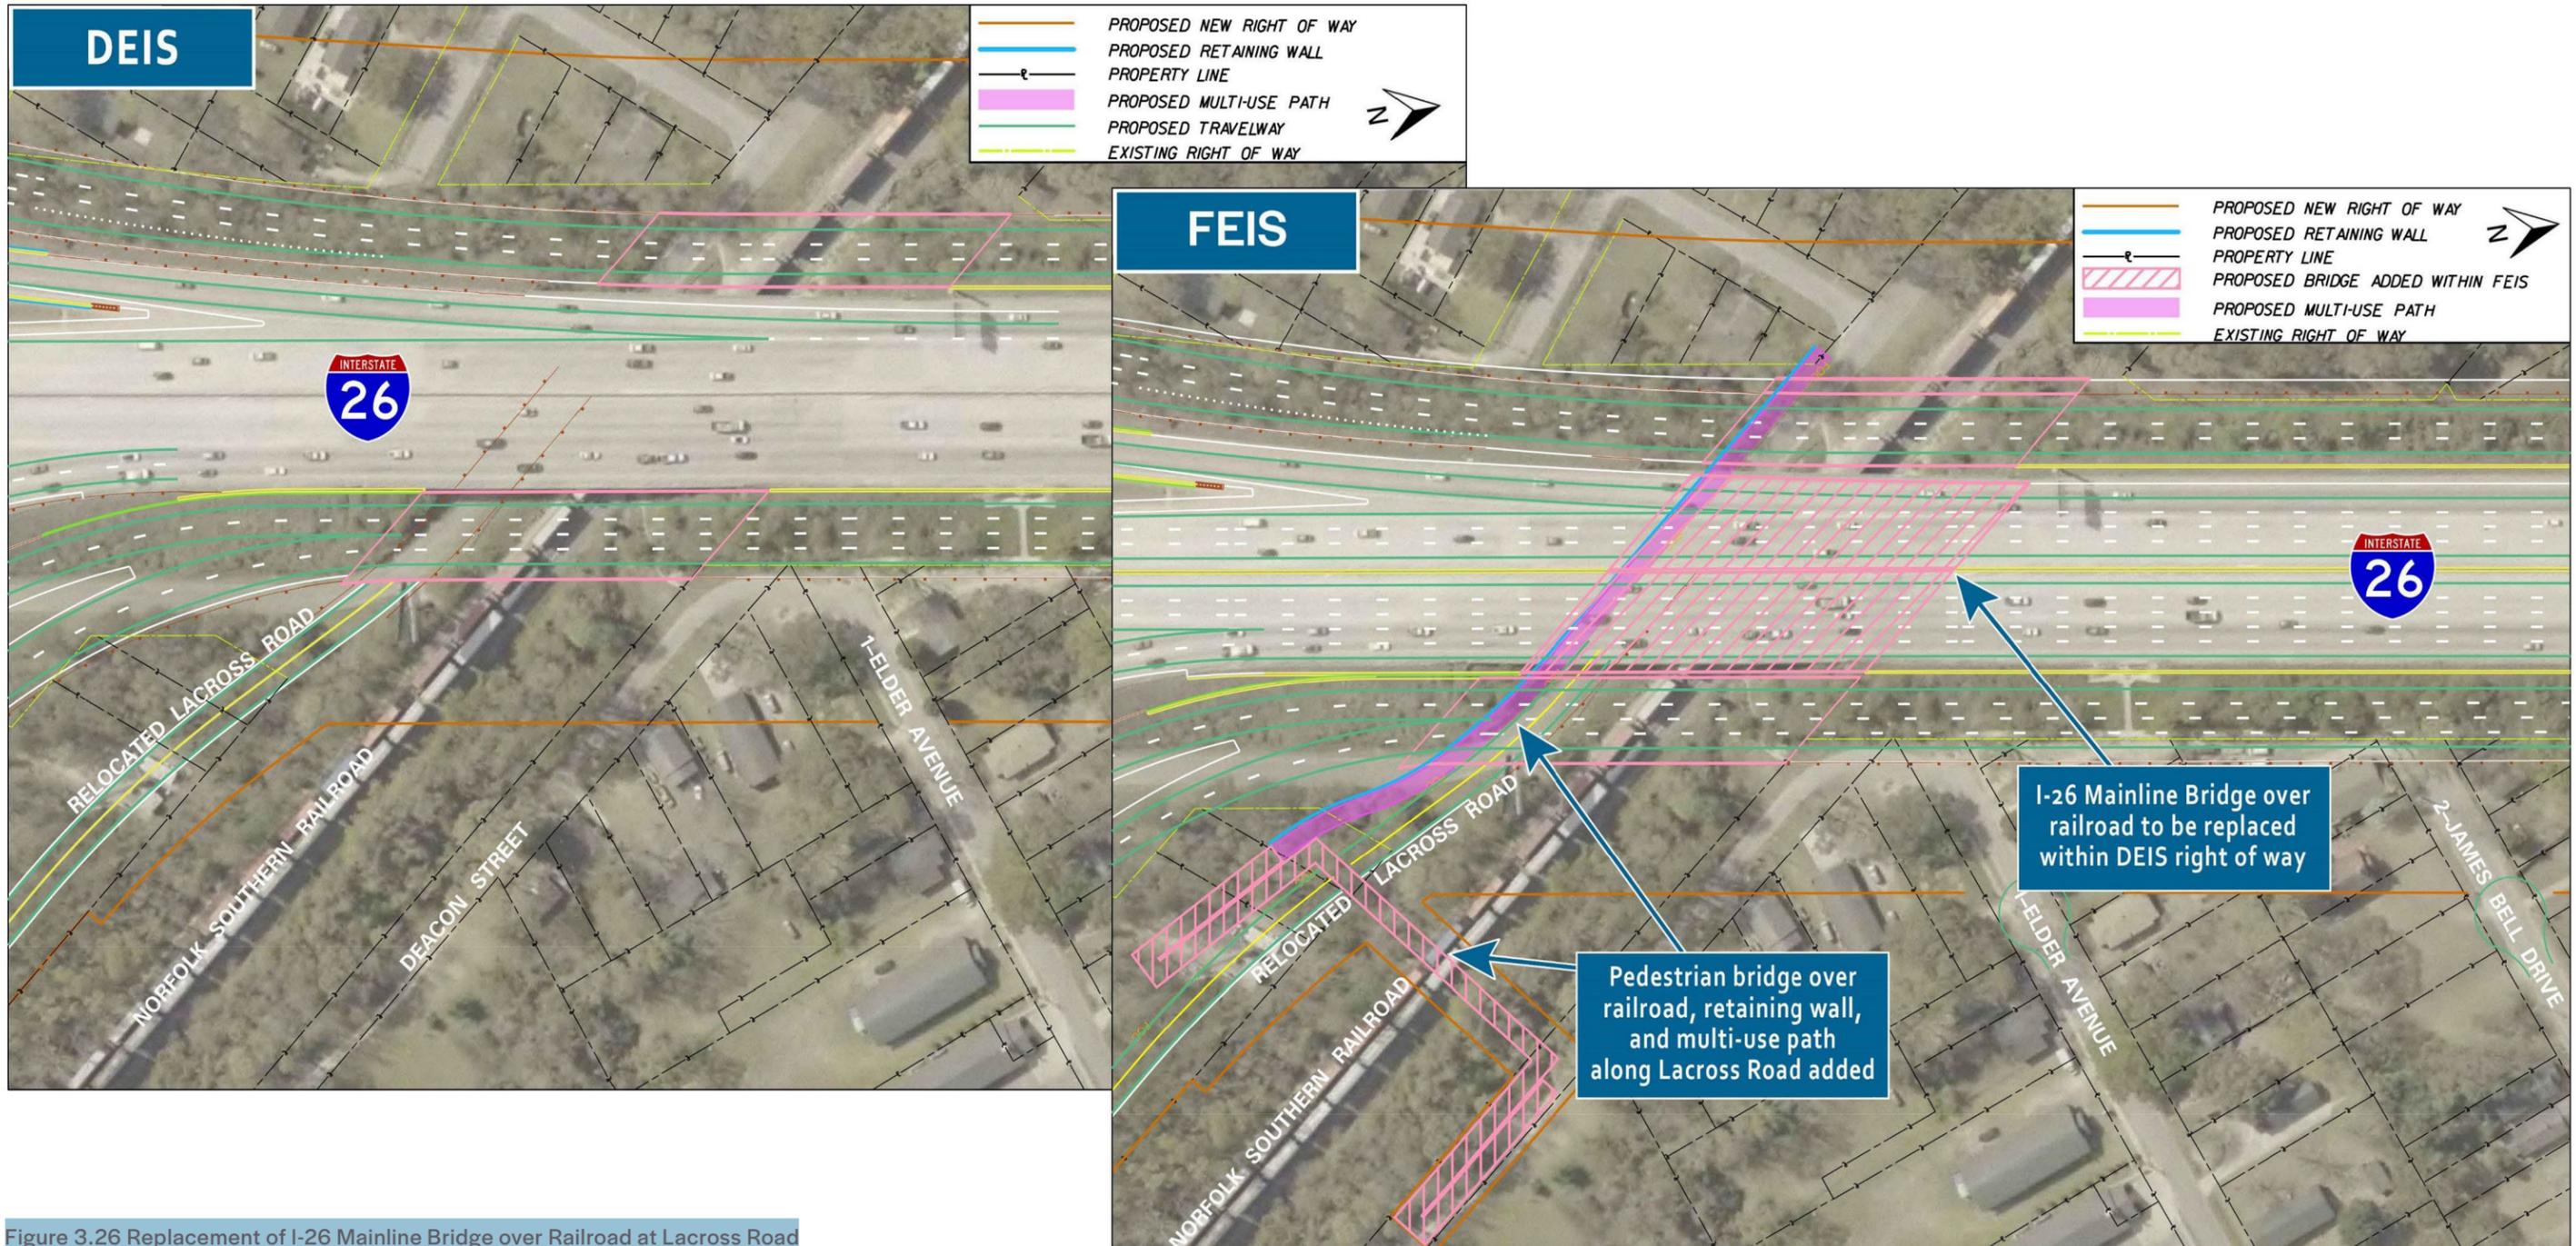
Replacement of I-26 Mainline Bridge over Railroad at Lacross Road
